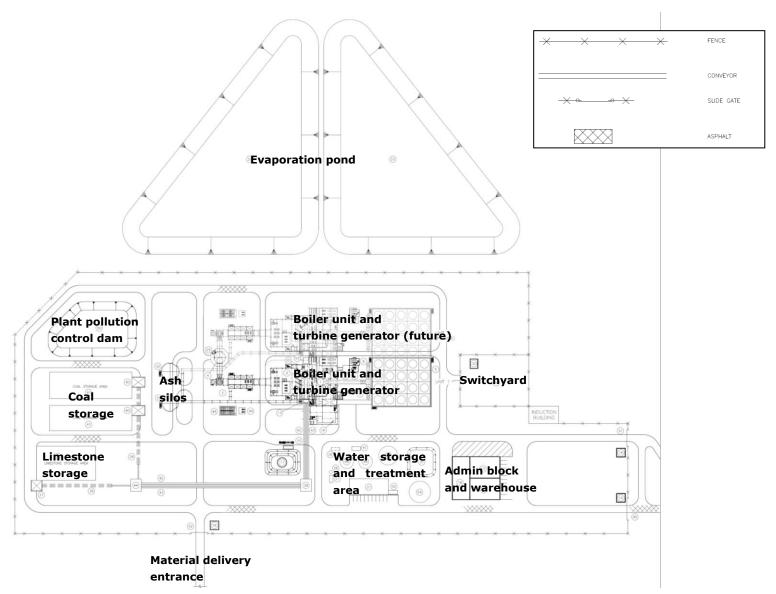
Site arrangements of the proposed Transalloys power plant and evaporation ponds (150 MW plant alternative) indicating some of the main components (Black & Veatch). Refer to Appendix A for detailed A3 layout
